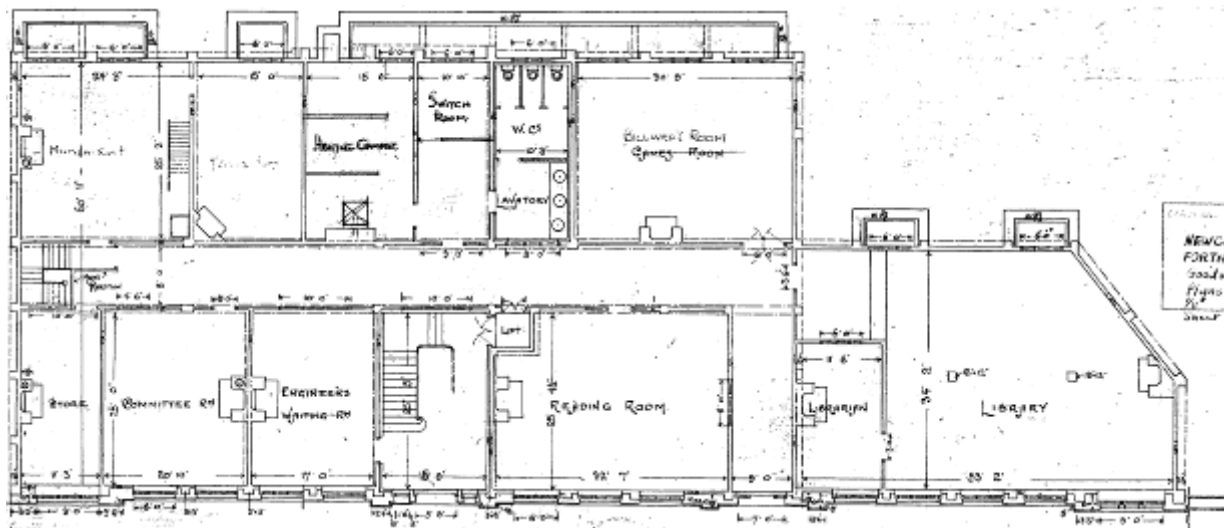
1904 Lower ground floor plan of Kings House, N is to the right
